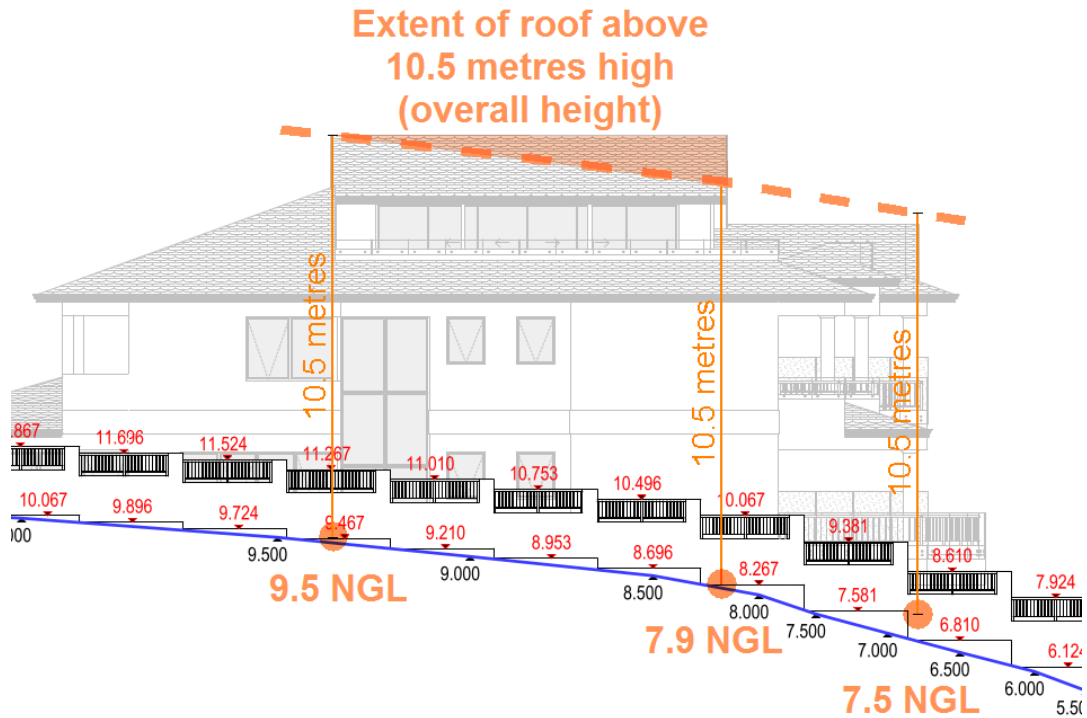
Elevation plan of the subject dwelling identifying the portion of dwelling exceeding the overall 10.5 metre building height.
